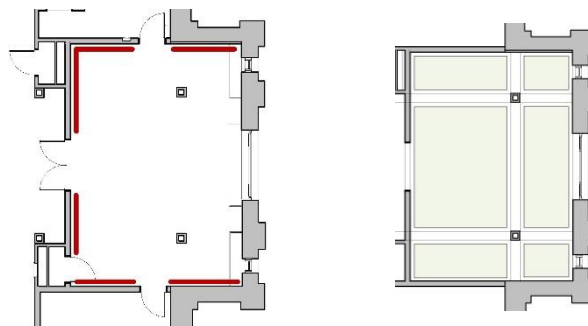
Executive Conference Room Floor Plan and Reflected Ceiling Plan
